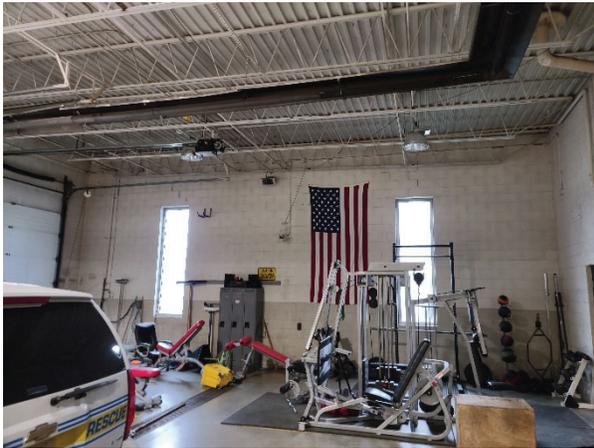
, showing the joists sloping from plan south to plan north (Left to right).
